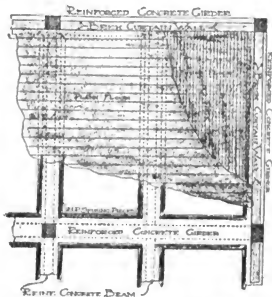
PLAN SHOWING SKELETON BEAMS AND GIRDERS WITH TIMBER FLOORING.
